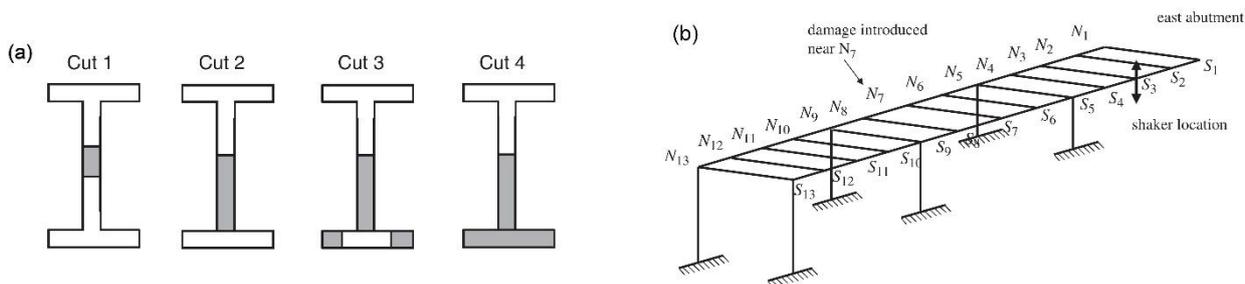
Damage in the I-40 Bridge: (a) the damage patterns, (b) the damage location and sensor networks (N: North and S: South)
